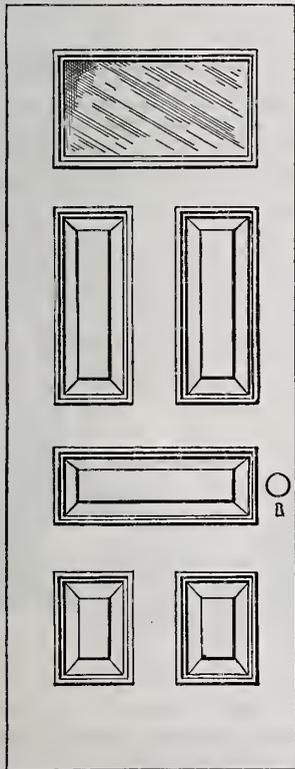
Elevation of Front Doors.—Scale, ½ Inch to the Foot.
